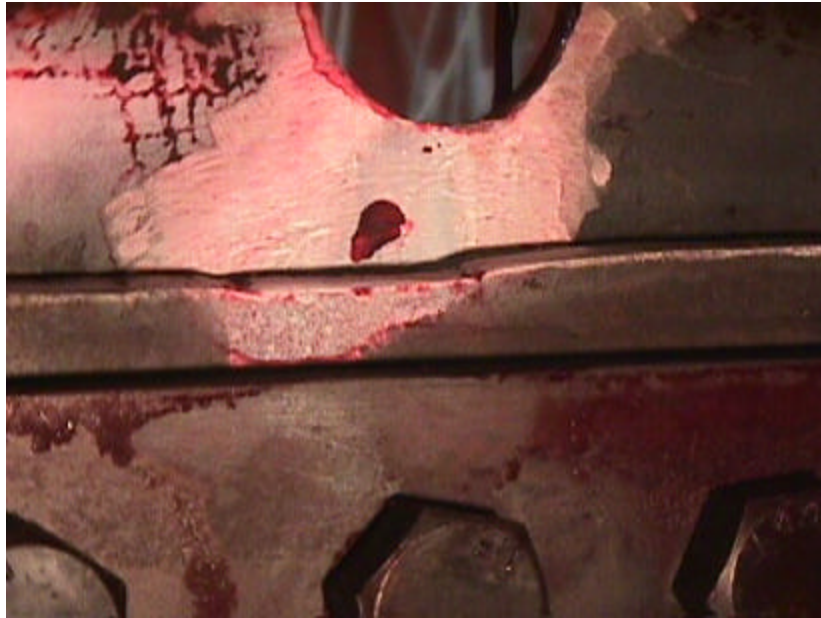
Re-initiation of crack from internal weld defect.
